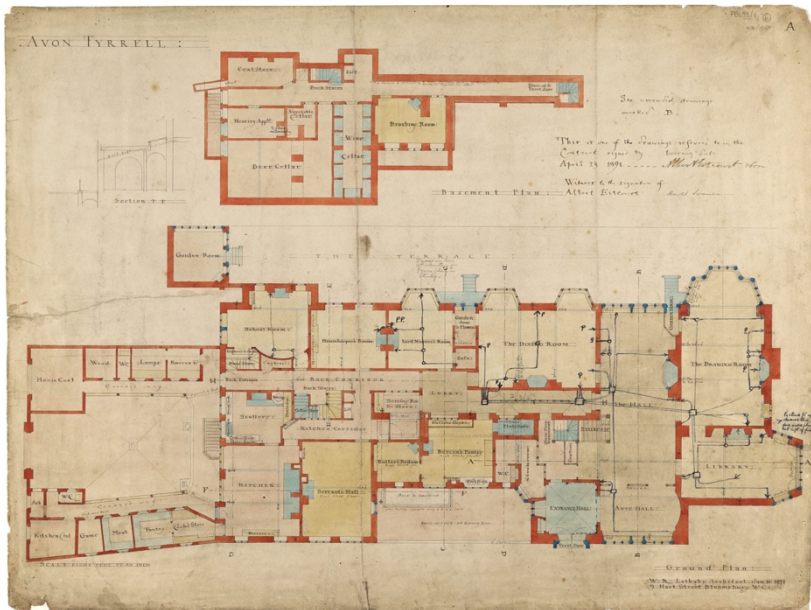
Avon Tyrell, Hampshire, W.R.Lethaby's Ground floor and cellar plan, Contract drawings, RIBA Drawings Collection, Victoria and Albert Museum
